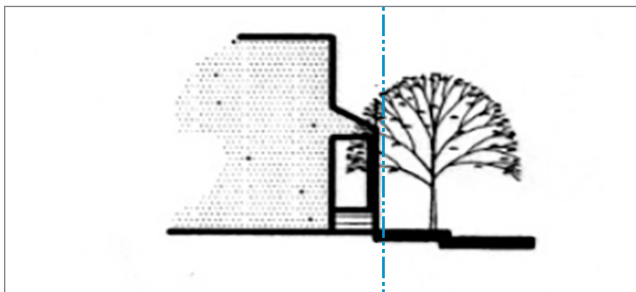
Stoop. A facade aligned close to the frontage line with the ground story elevated from the sidewalk, securing privacy for the windows. This type is suitable for ground-floor residential uses at shallow setbacks with row houses and apartment buildings. *An easement may be necessary to accommodate the encroaching stoop.
